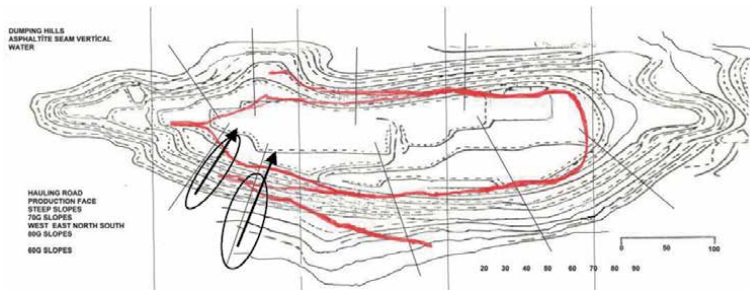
Sliding shale areas contour topography of Şırnak Avgamasya open pit No.1 mining area and survey area 1/5000.
